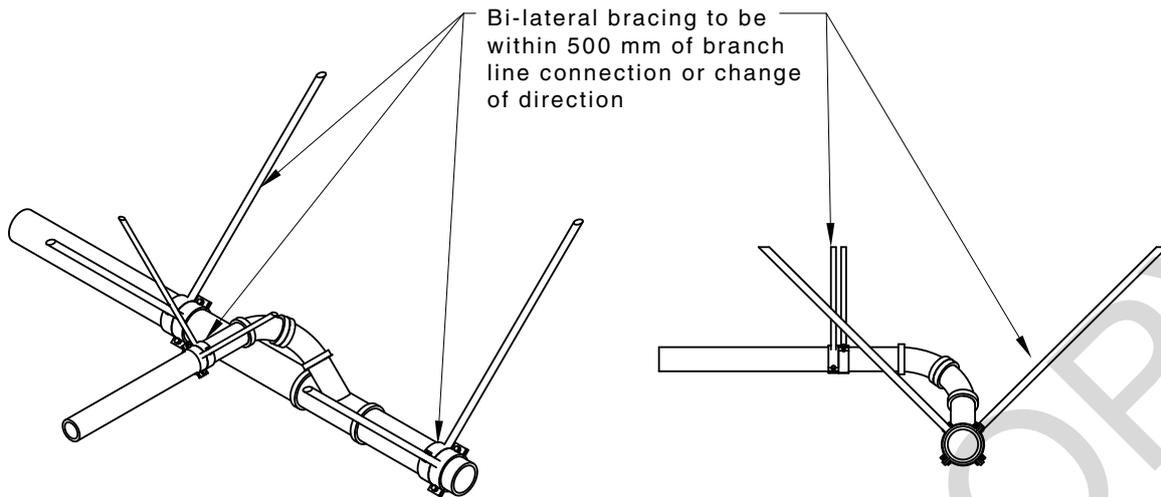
BILATERAL BRACING DETAILS
